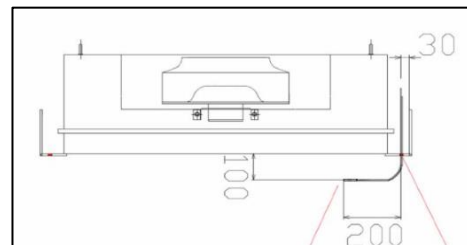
Example Cleanroom T&H Transmitter and Probe Mounting Detail
